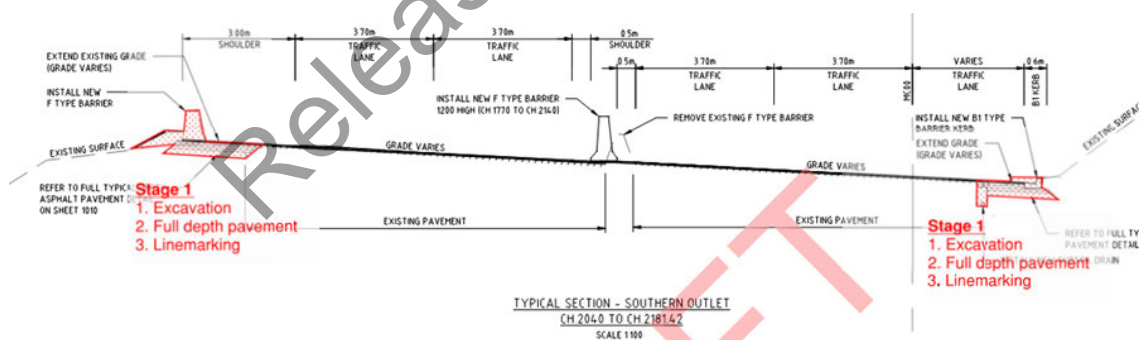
Typical section – Southern Outlet Ch. 2040 to Ch. 2181.42
